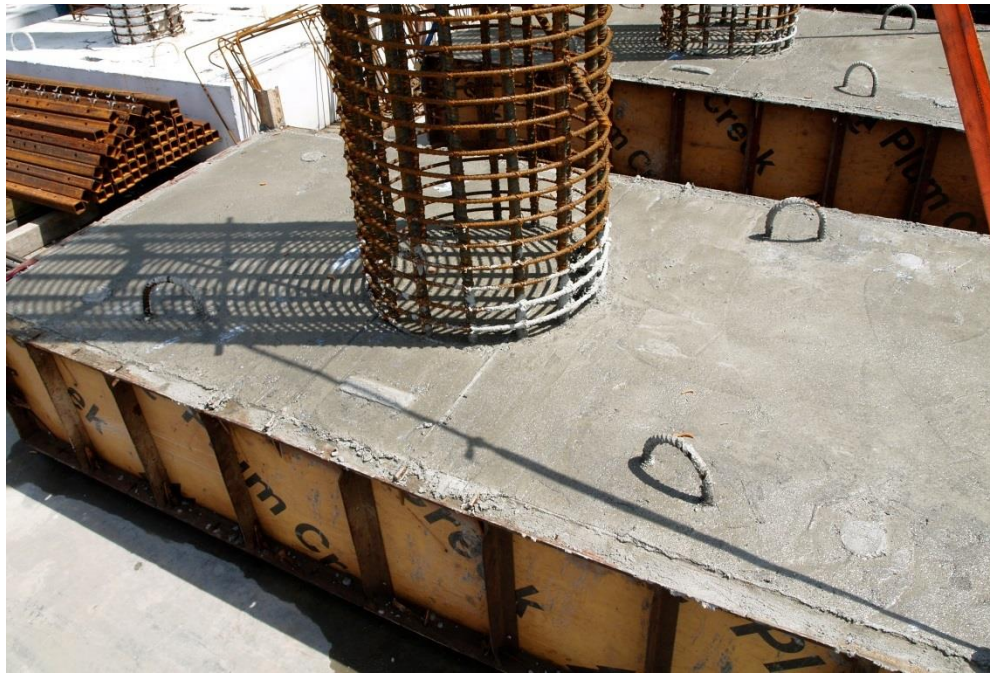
Casting of the Footing Concrete with Rented Formwork
